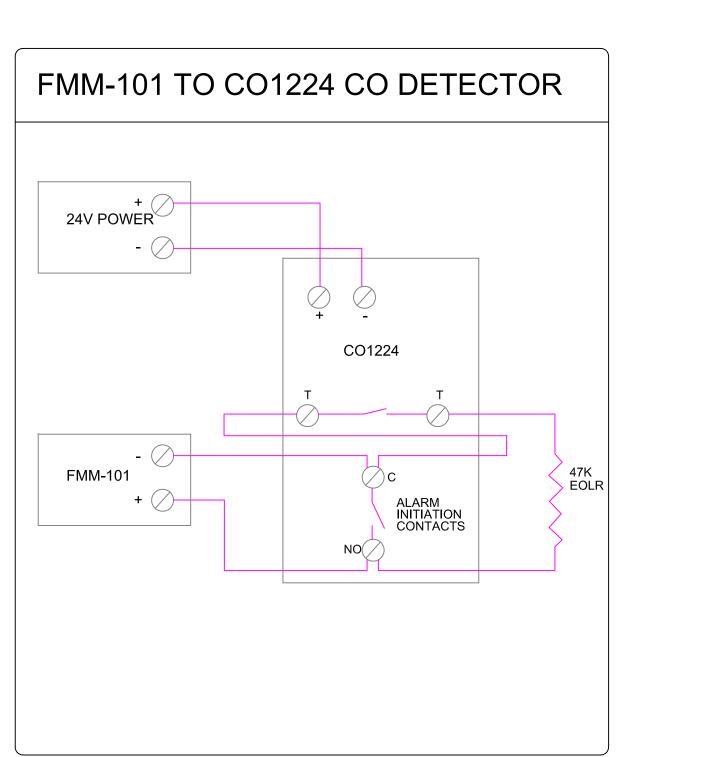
DETAIL SHEET IS TYPICAL. NOT ALL DEVICES OR DETAILS SHOWN WILL BE APPLICABLE TO THIS PROJECT.
